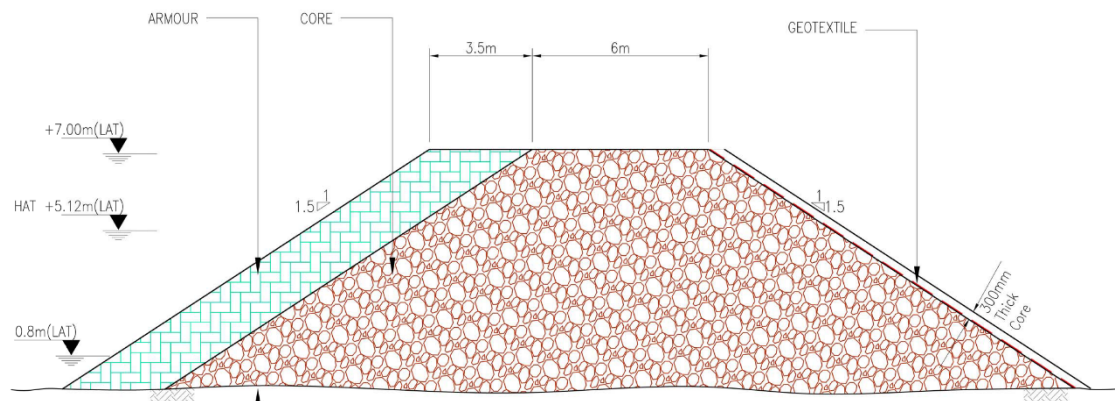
Western Basin Expansion typical section of bund wall armour, core and geotextile (bund wall type B1)
